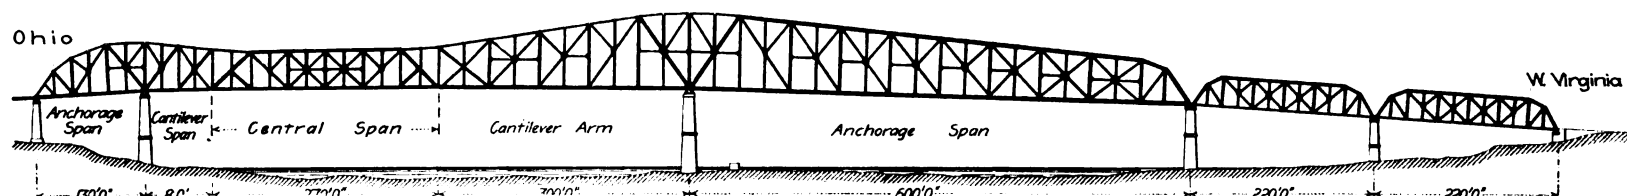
UNSYMMETRICAL CANTILEVER HIGHWAY BRIDGE AT MARIETTA, O.; OHIO RIVER BRIDGE & FERRY CO. C. L. Strobel, M. Am. Soc. C. E., Chicago, Consulting Engineer; American Bridge Co., New York, N. Y., Contractors.
